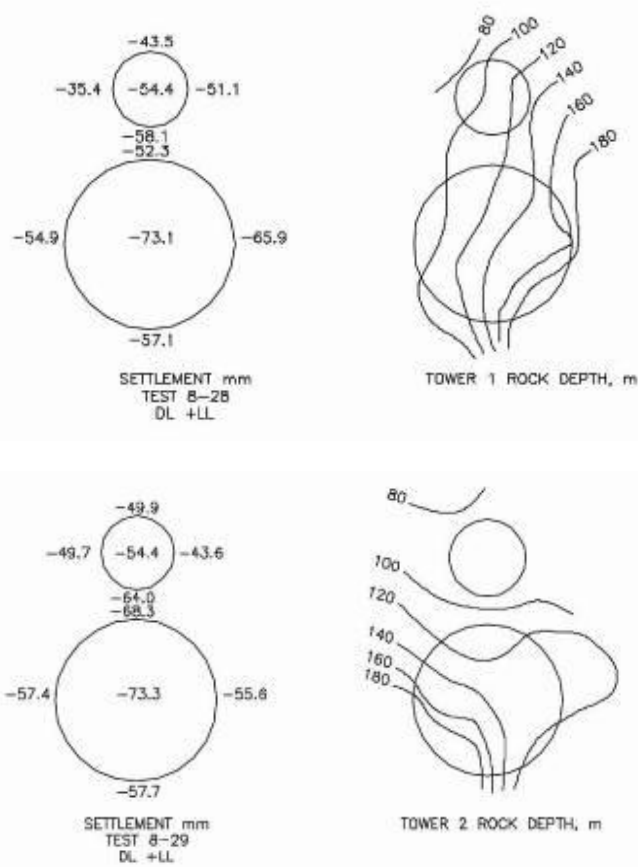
Predicted Settlement Maps and Rock Contour Plan – Tower 1 (top) – Tower 2 (bottom)
